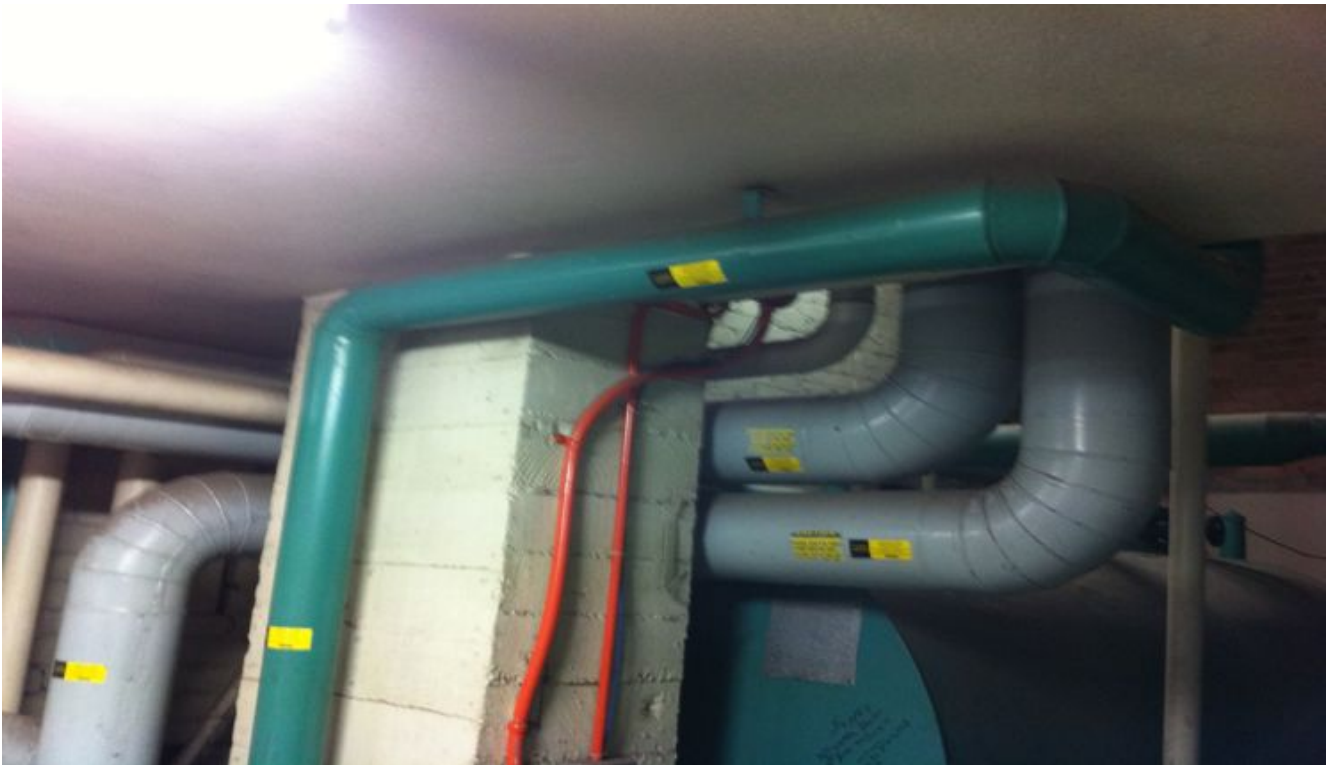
Asbestos insulated pipe work in the Plant Room on Level 3 ½ of the South Wing – Menzies Hotel.
